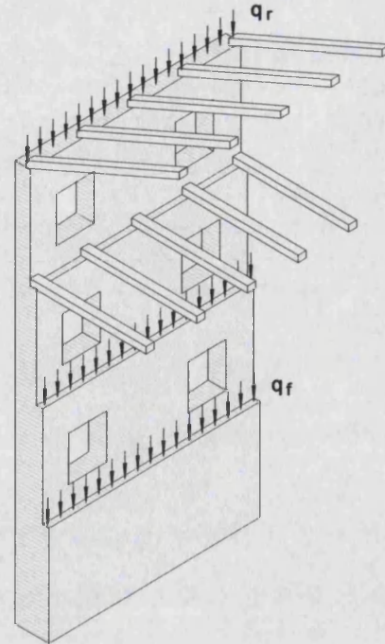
10– Weight of horizontal structures and roof spread along the wall façade.
